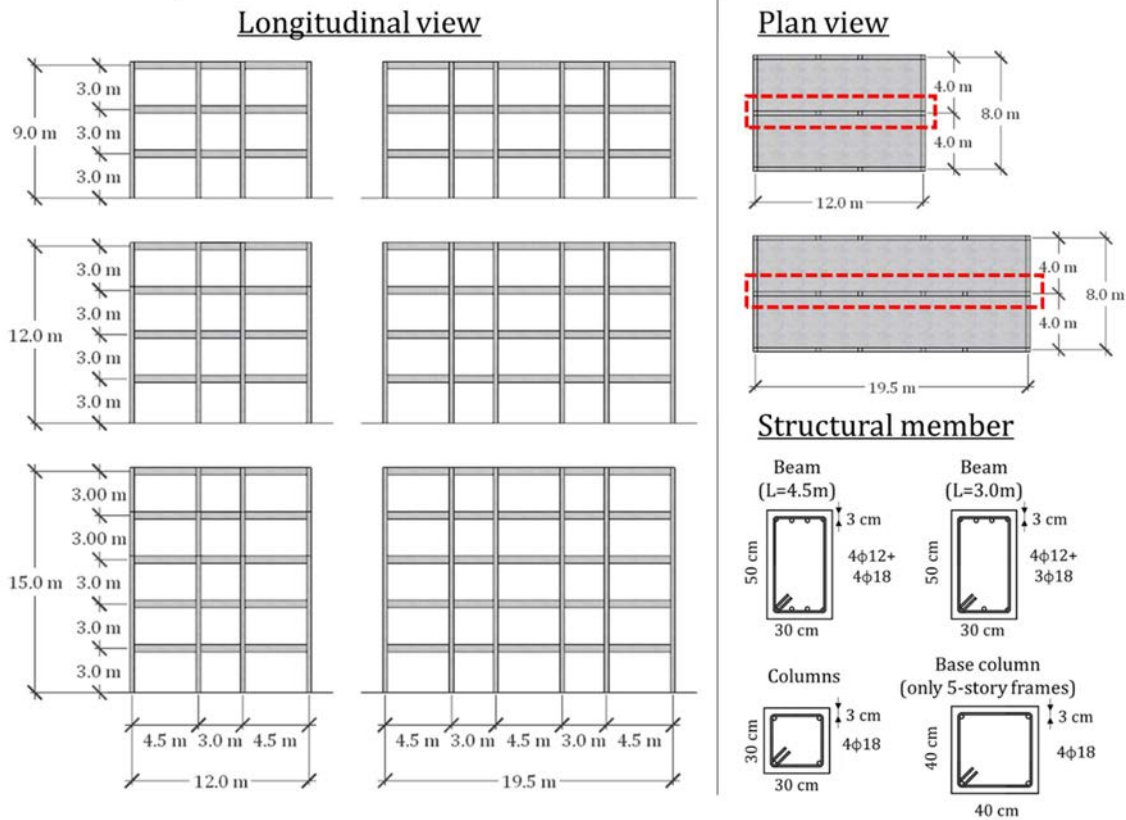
Plan view (upper right) of the case-study frame structures and geometry of the analysed frames (left); geometrical and reinforcement details of the RC structural members (lower right).
